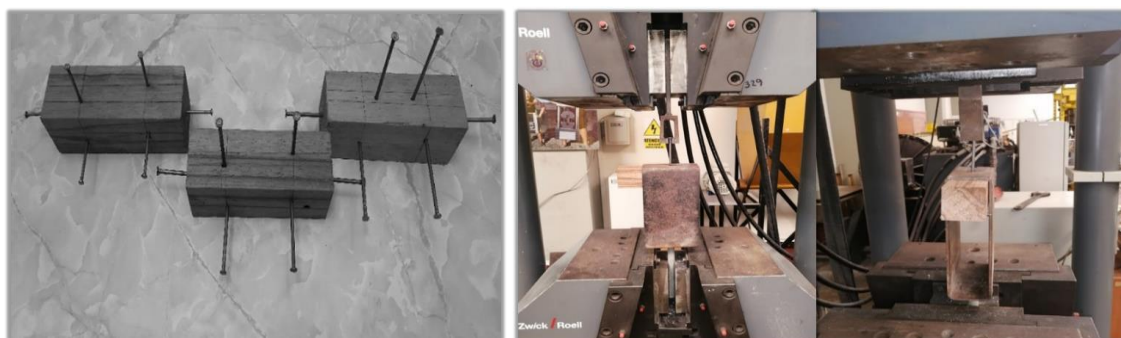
Arrangement of nails for extraction tests. Figure 9: Specimen nail extraction.
